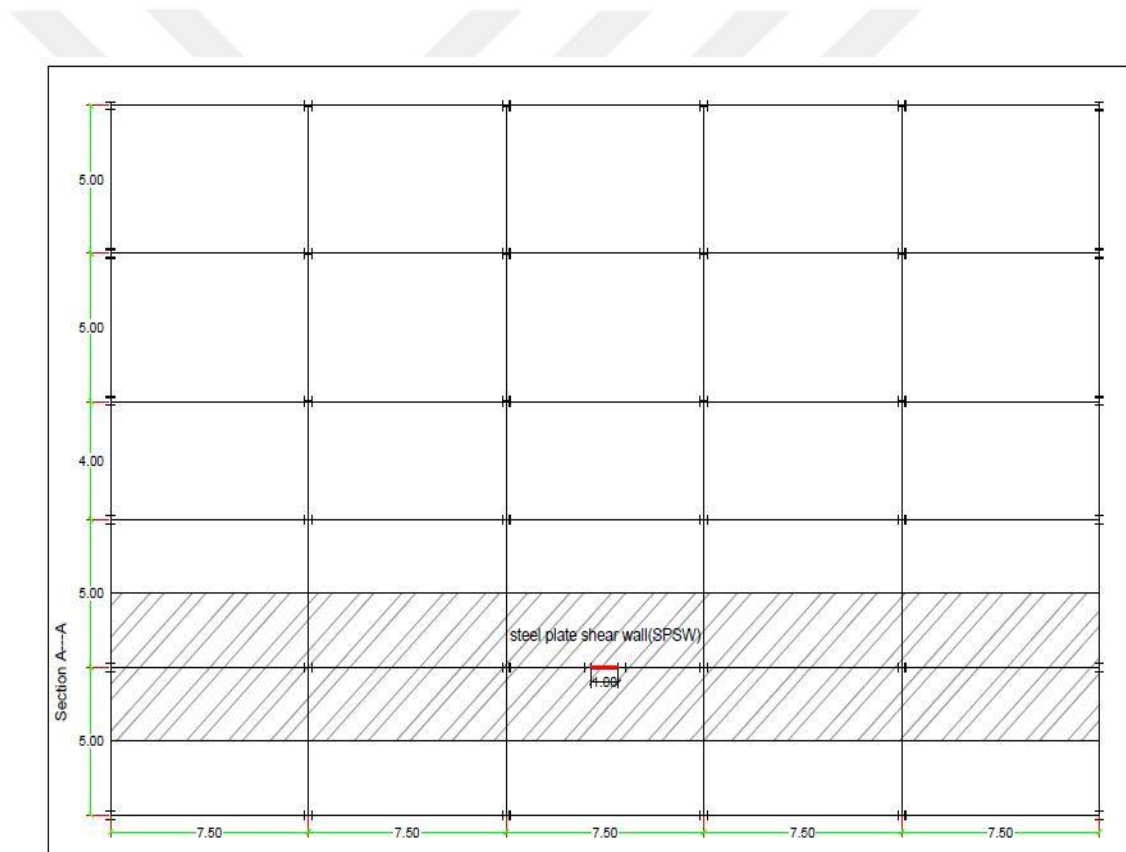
Plan of 4-story building with steel plate shear walls having aspect ratio of 0.285 (Model 1)
